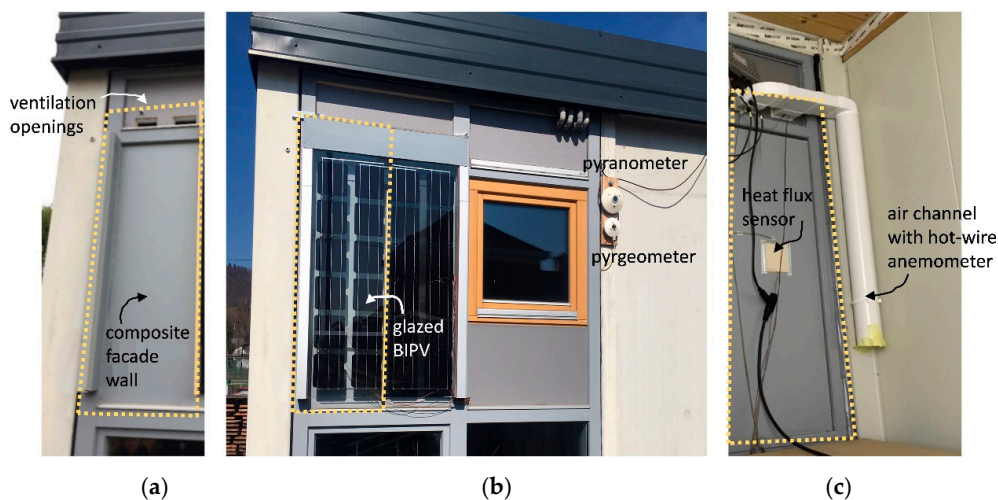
Experimental semitransparent building integrated photovoltaics (BIPV) glazed façade structure (shown by the rectangle section). (a) The façade wall with two ventilation openings, each of them was enclosed by a fan; (b) BIPV glazed structure installed 80 mm in front of the façade wall, and (c) interior of experimental BIPV façade structure—air channels were thermal insulated during the experiment.
